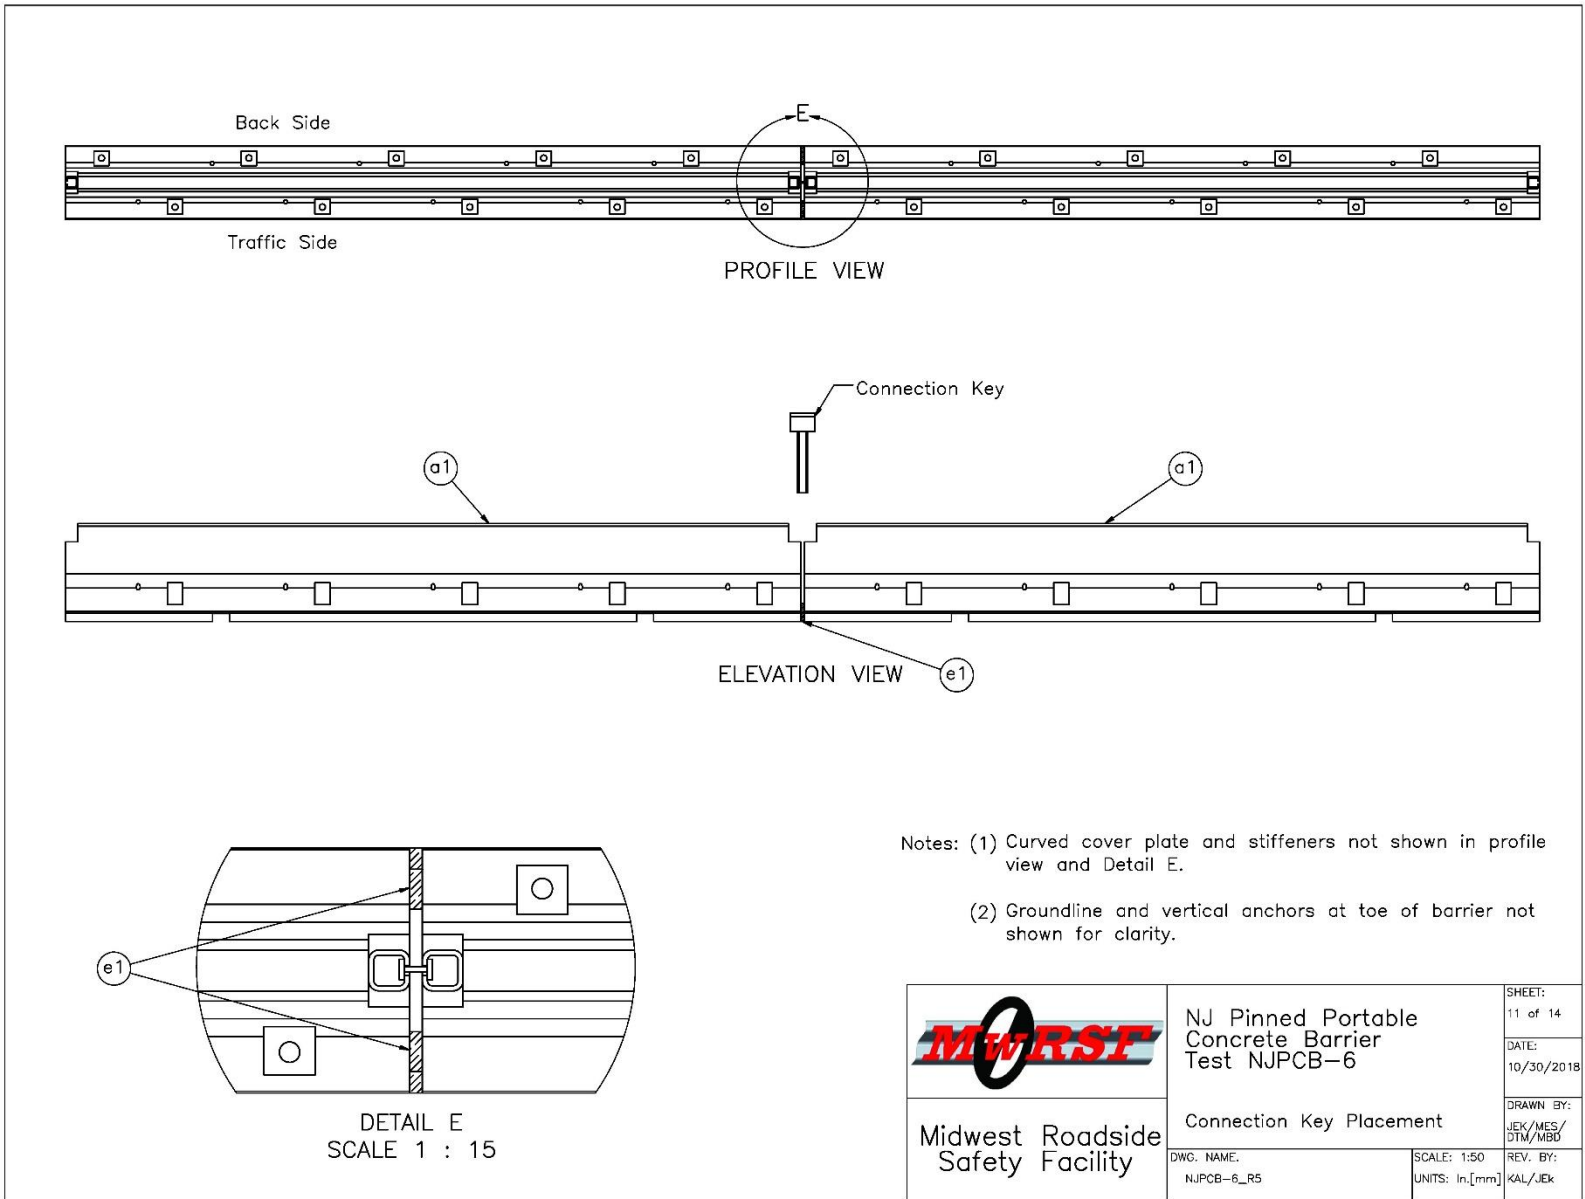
Connection Key Placement Details, Test No. NJPCB-6
